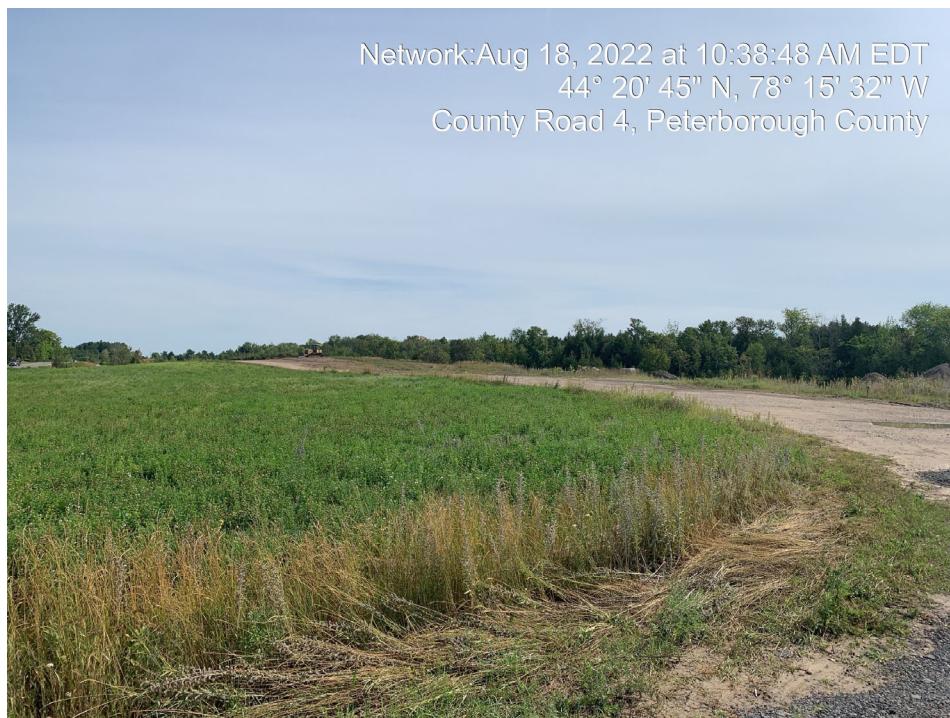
View of the Site, facing east, showing future soil filling area in background
